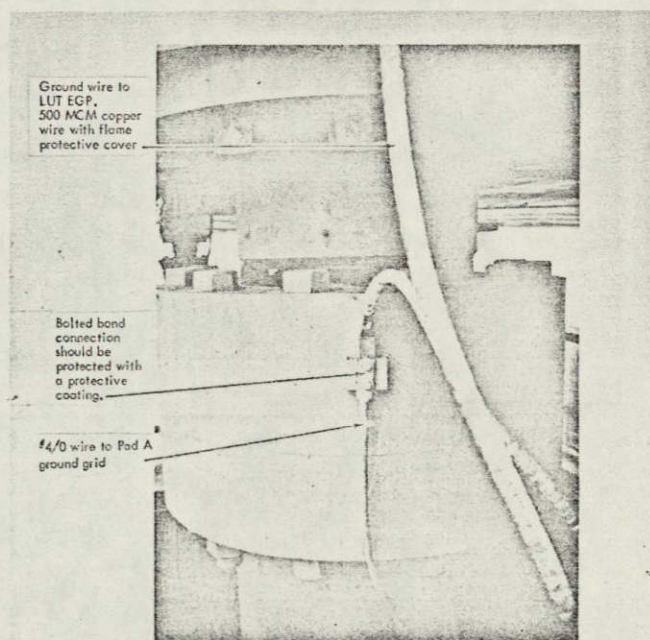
LC-39, Pad A-Ground Connection for LUT. Note lack of protection on lower half of connection.
